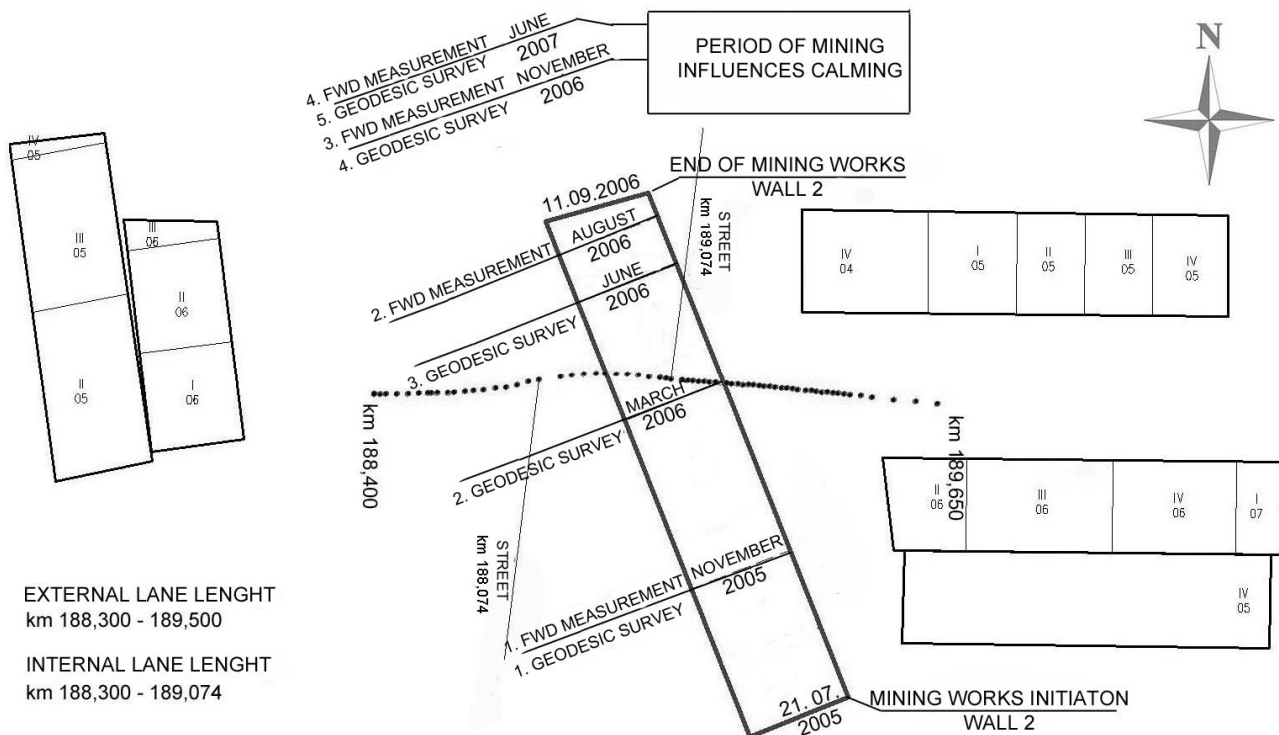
Location of the mined longwalls with respect to the observed road section [1].
